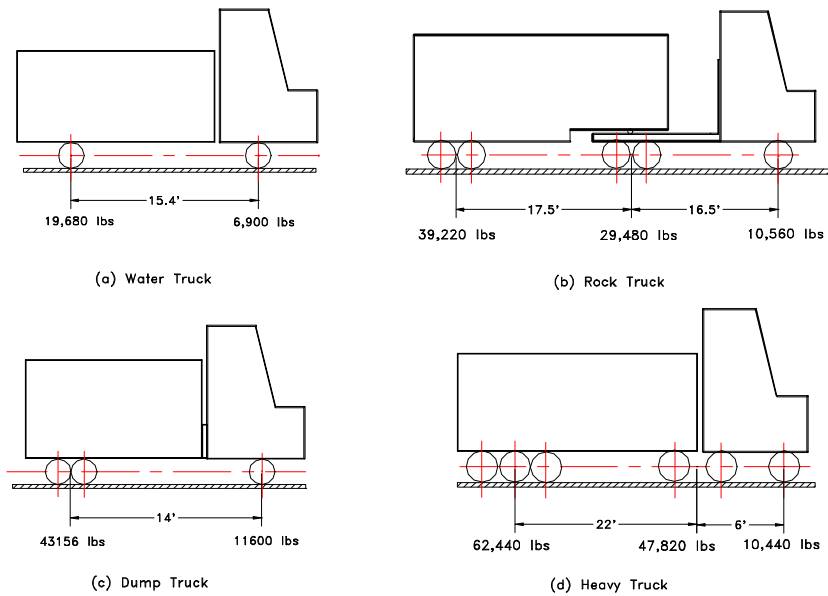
Test Trucks' Wheel Loads and Axle Spacing
